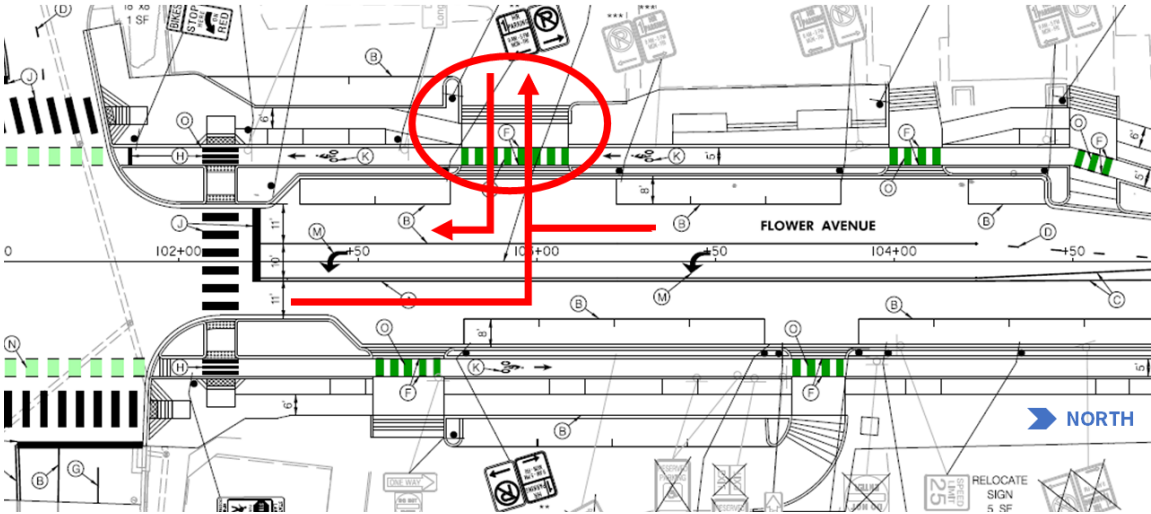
Driveway to One-Way Parking Lot Where Entrance Could Be Narrowed
